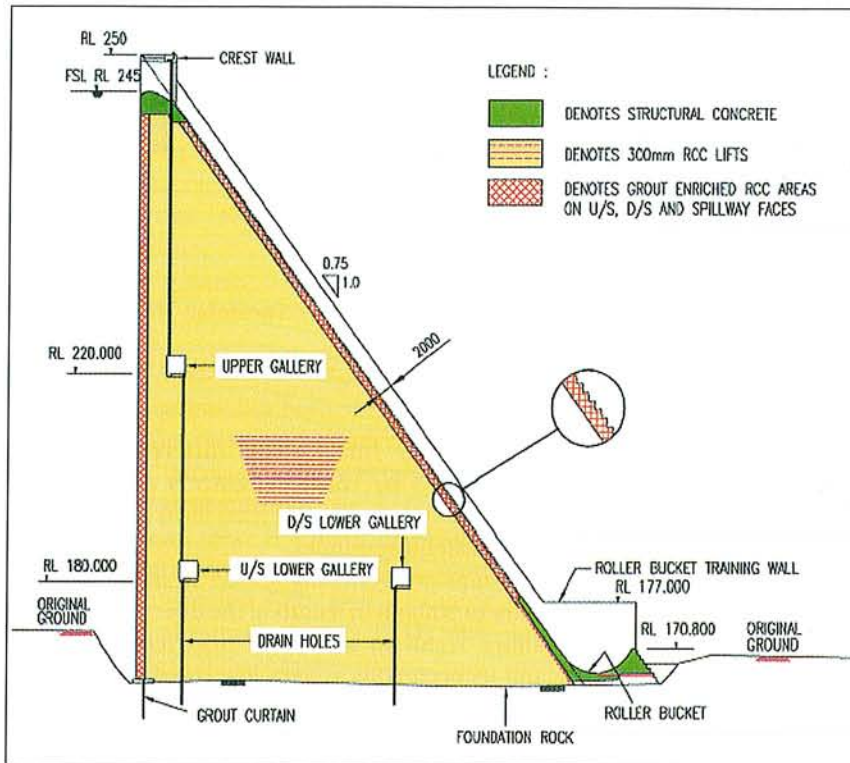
Typical Cross Section of Sg. Kinta Dam
